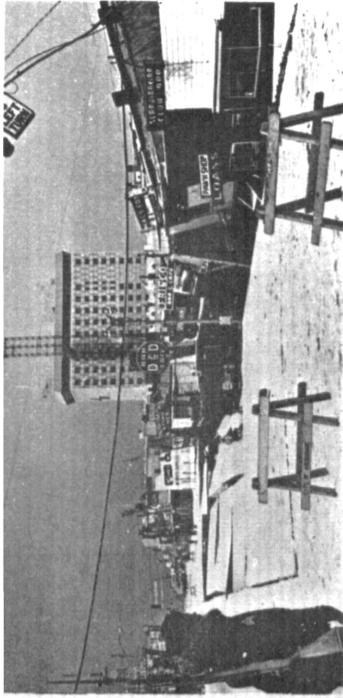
Fourth Avenue landslide damage. Anchorage-Westward Hotel in the background.
